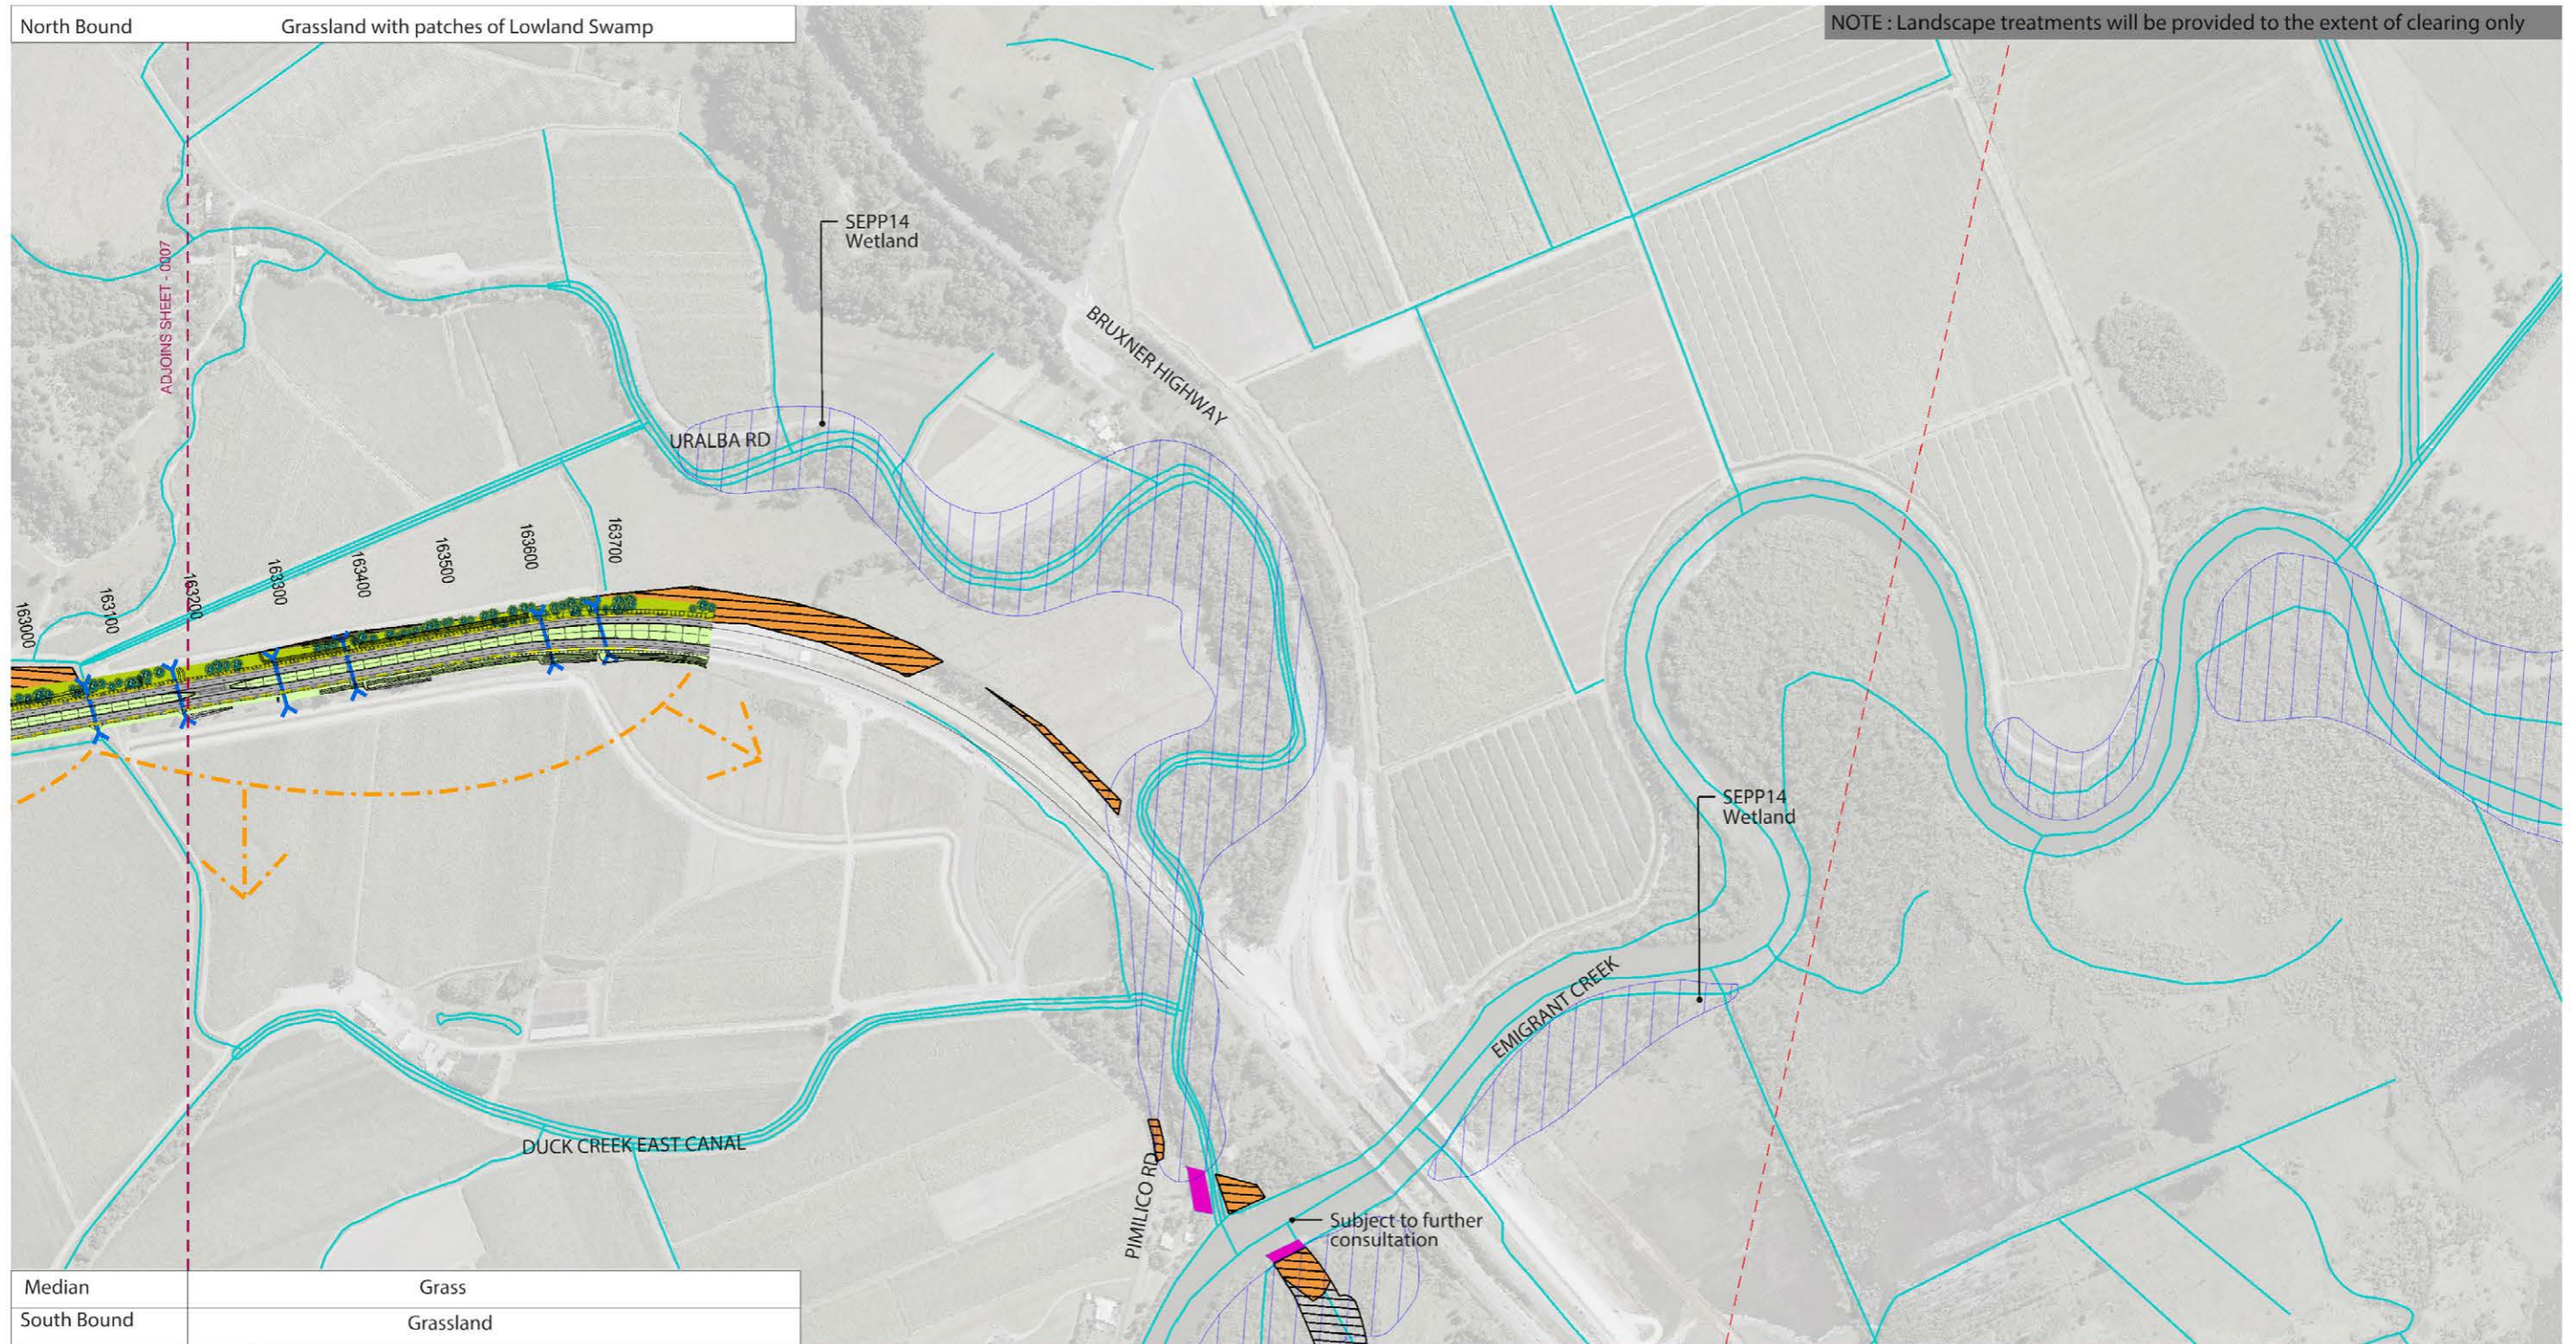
Urban and landscape design plan - Sheets 7 and 8 (Scale 1:8000)
